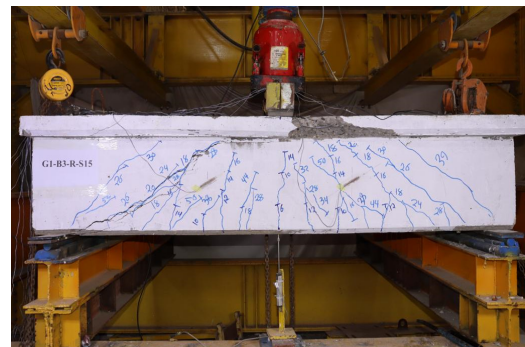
Failure crack pattern of specimen G1-B3-R-S15.
